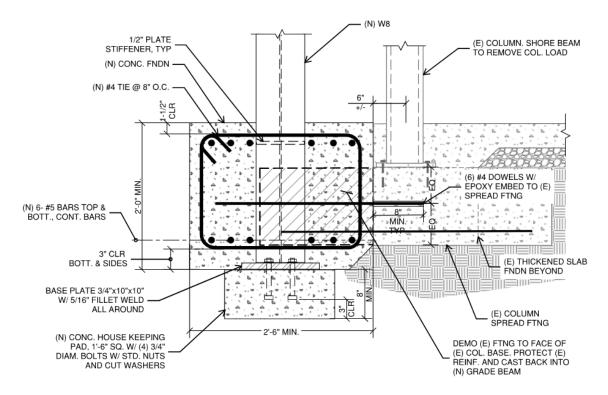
Bottom of steel cantilever column located outside of the building footprint.
